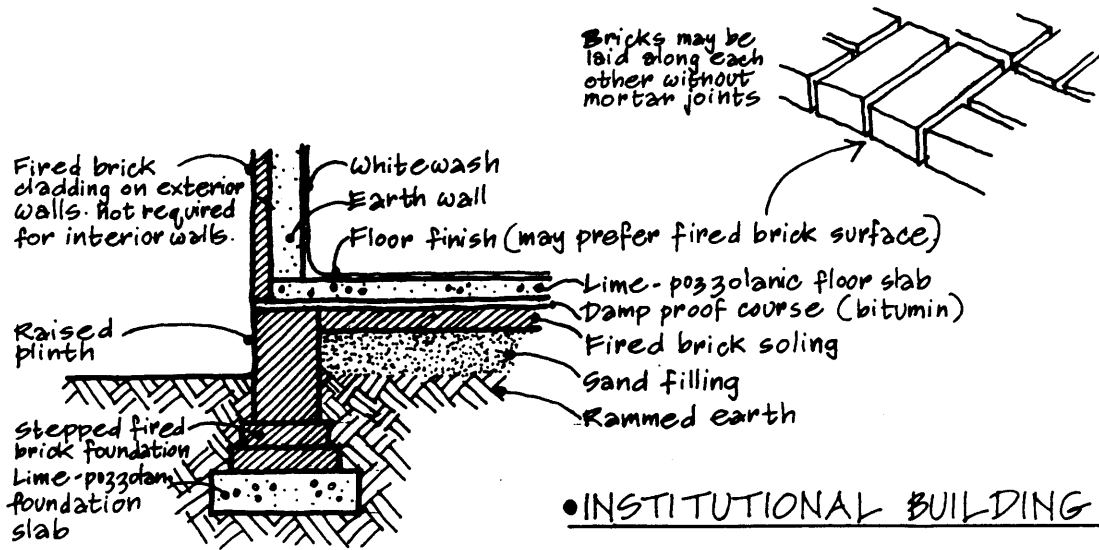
Some methods for damp-proofing floors of earthen buildings.
